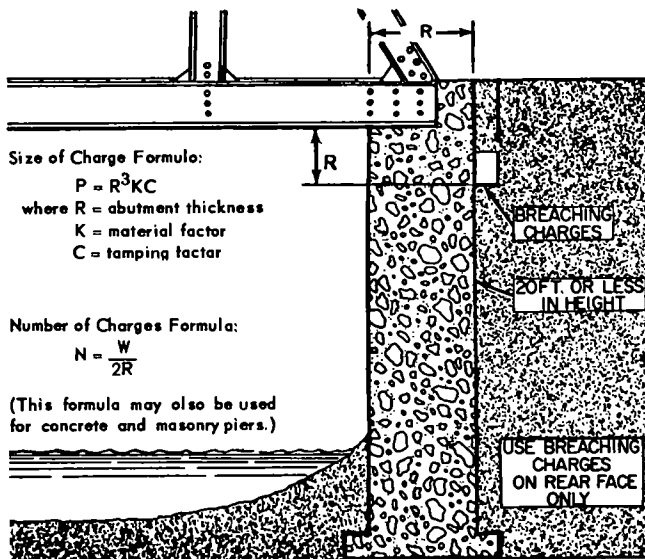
Charges in a fill behind a reinforced concrete abutment more than 5 feet thick and 20 feet or less in height.
